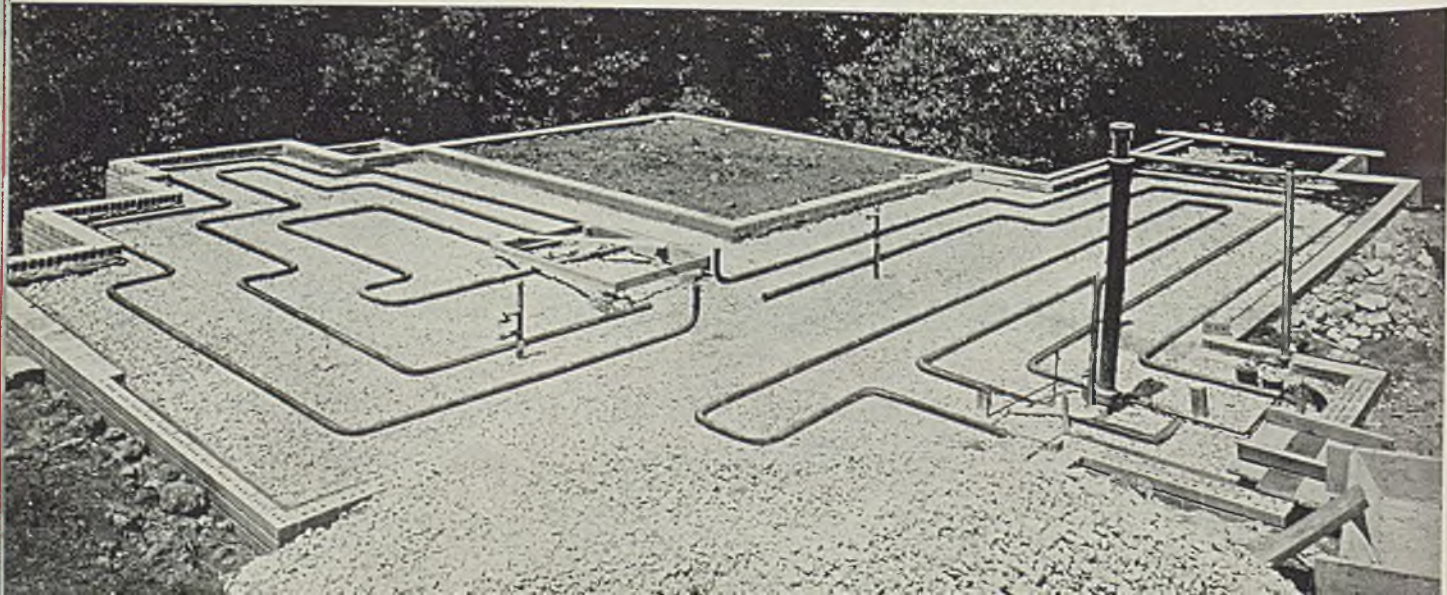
(Top)—This was the first step in the installation of a radiant heating system in an office building, preparing the broken stone fill on the first floor
